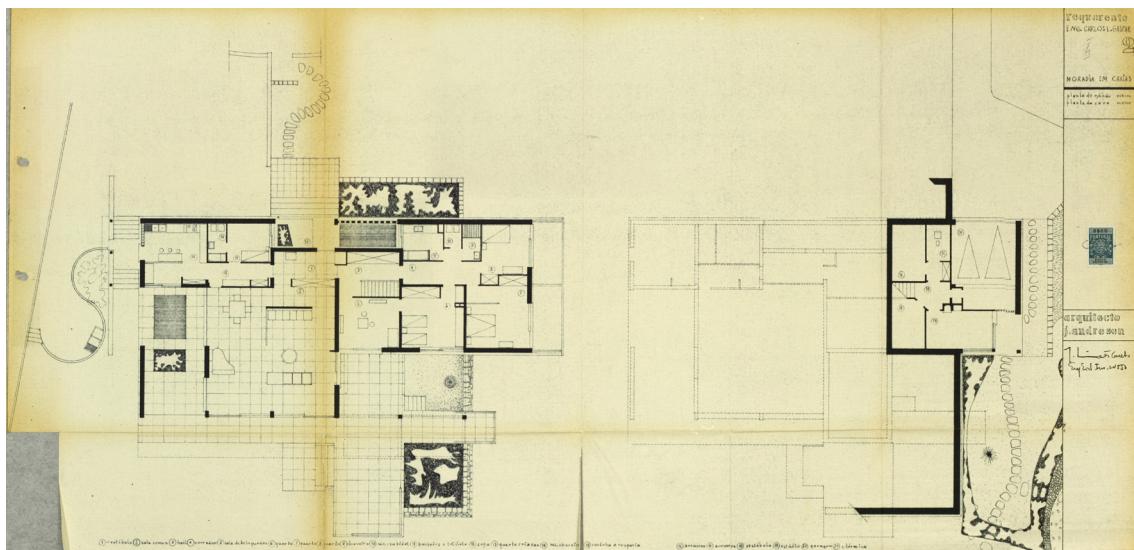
João Andresen, *Ground floor plan and Basement plan* (licensing architectural project), 1955
